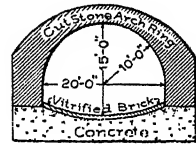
Section of a Large Sewer in St. Louis, Mo.
